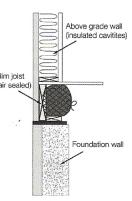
Insul-Bag* used to insulate bandjoist.
